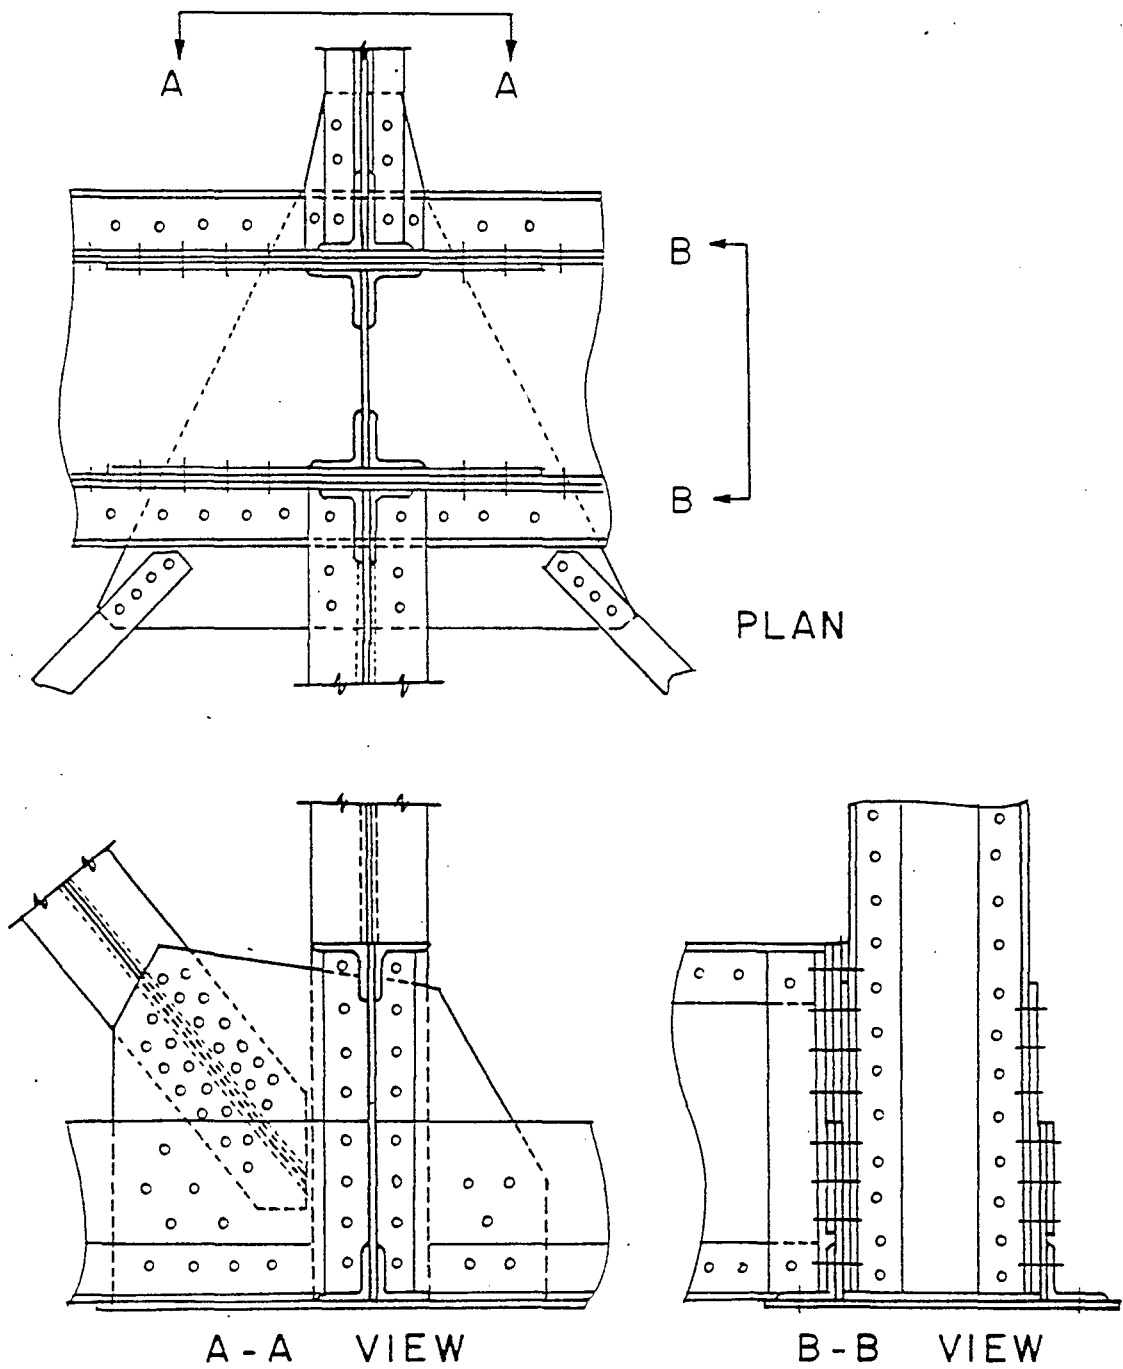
Riveted Truss Joint Detail - Detail 2
